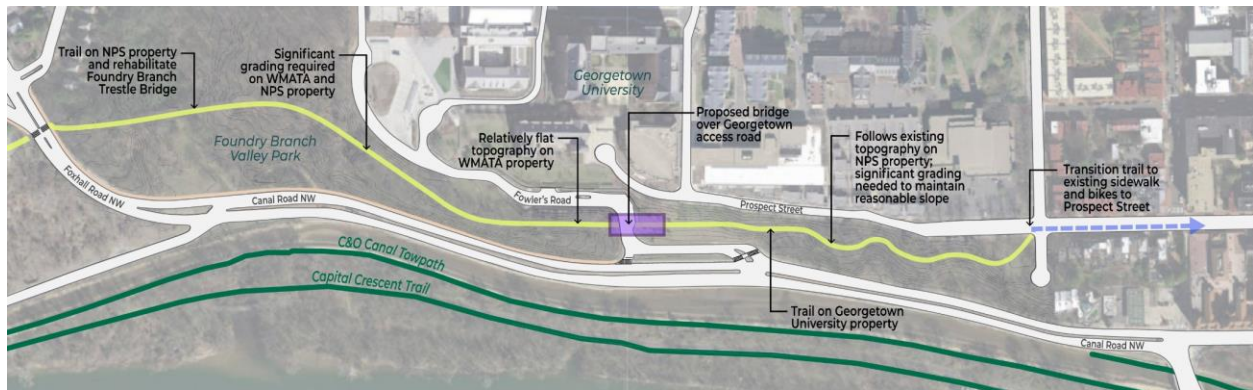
| Trail Alignment Option 3: Foundry Branch Trolley Trestle Bridge to Fowler Road to Canal Road
